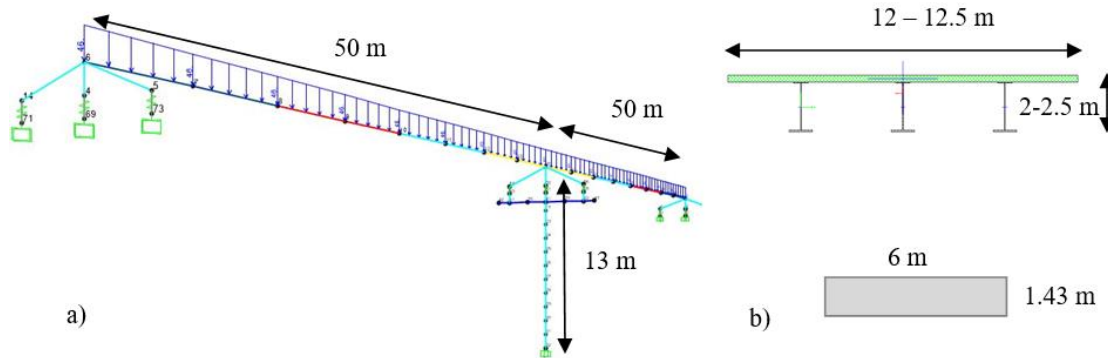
Isolated Bridge numerical model in SAP2000 [22]: a) lateral view of the bridge stick model; b) deck and pier sections; The no-isolated bridge model is without the nonlinear link on the top pier and on the abutments
